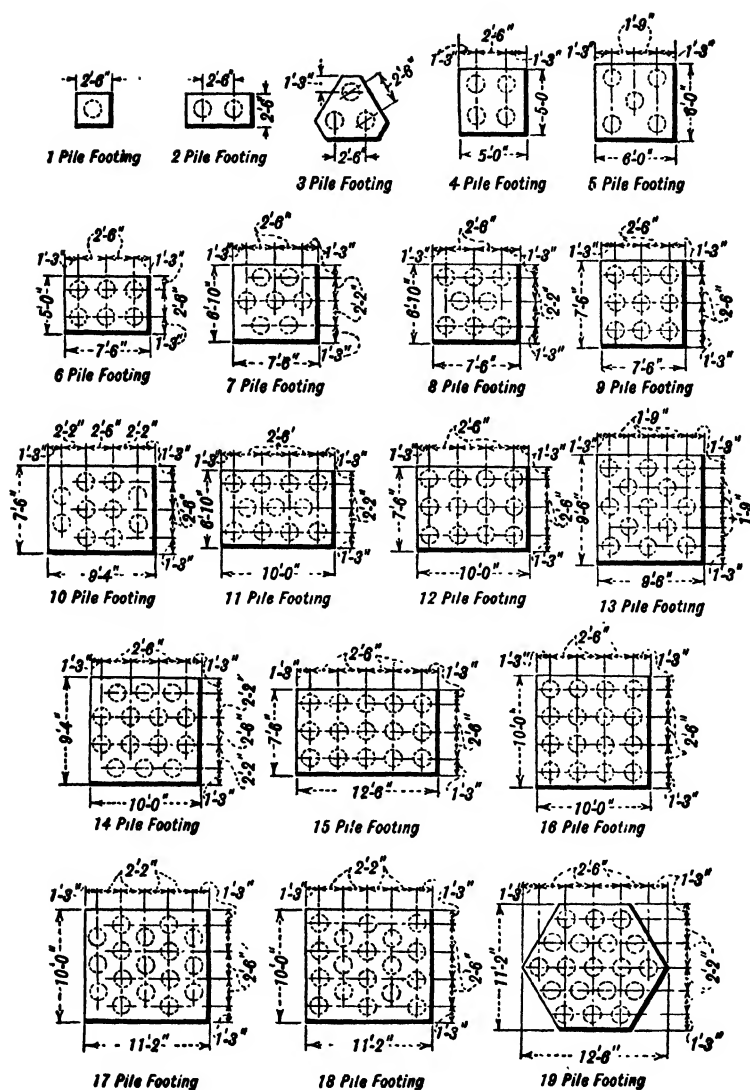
Shape of Footings for Different Arrangement of Piles. (See p. 516.)
